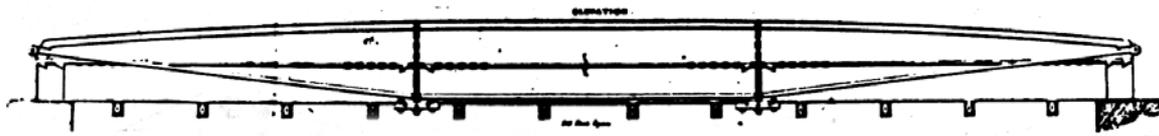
'Trussed' cast-iron girder with span of 29.3 m (96 ft) for the Leopold Railway. Six castings with vertical and horizontal joints and wrought-iron ties on each side. (Sutherland²)
